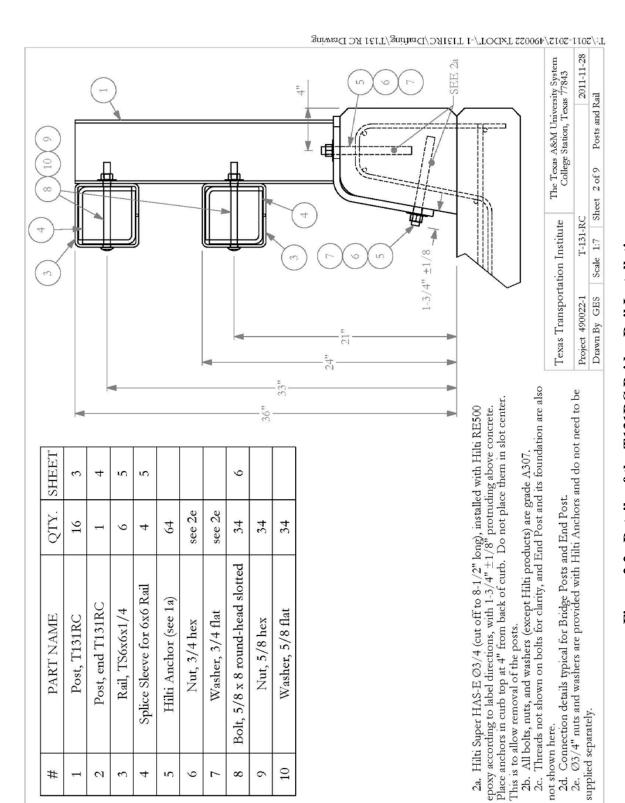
Details of the T131RC Bridge Rail Installation.
